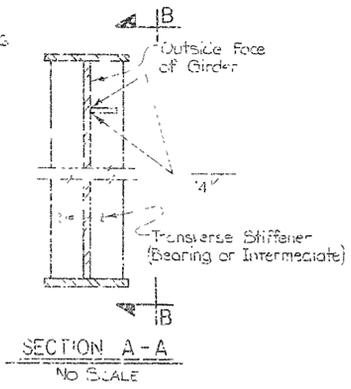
DETAILS OF TRANSVERSE INTERMEDIATE STIFFENERS
